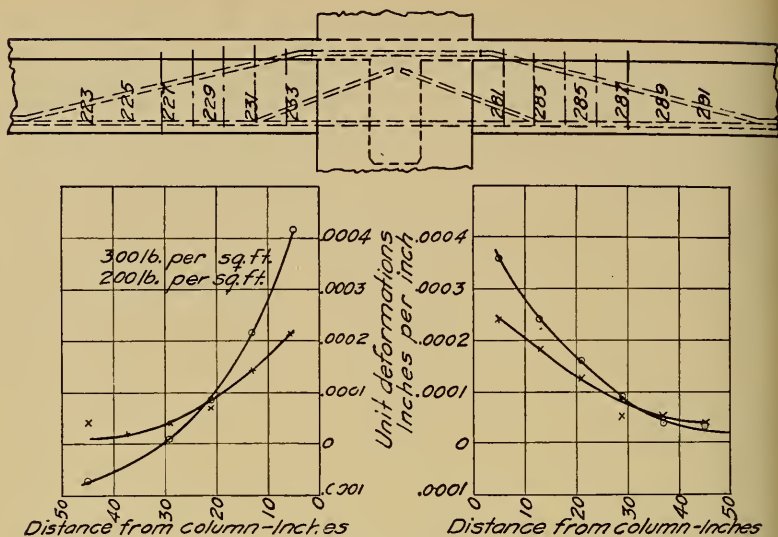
DIAGRAM SHOWING DISTRIBUTION OF COMPRESSIVE DEFORMATION IN BOTTOM OF COLUMN BEAM.
